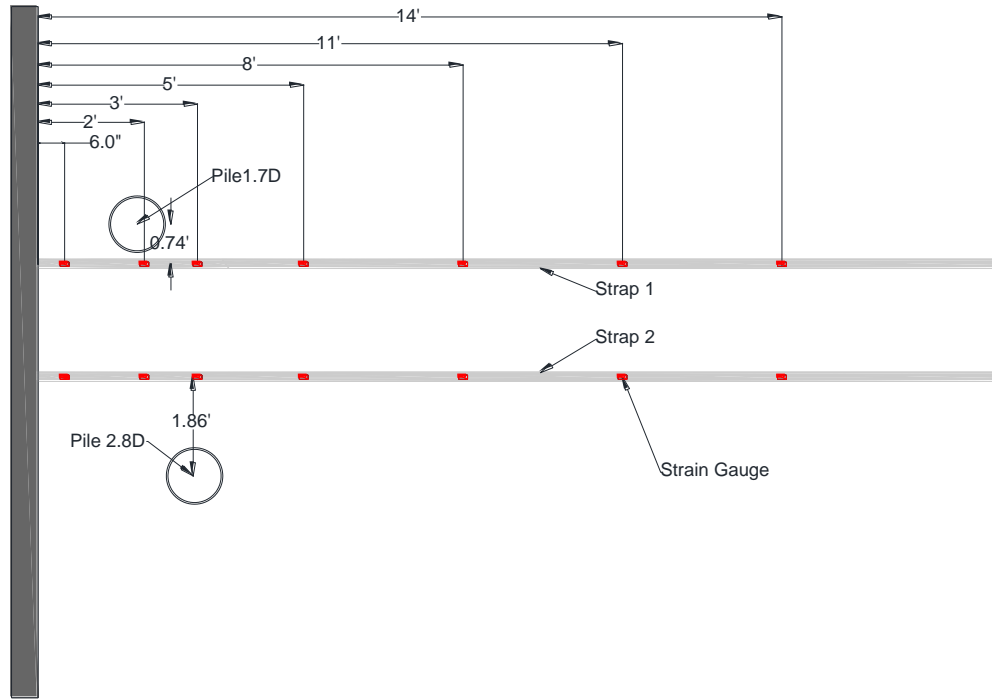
Plan view of the top layer of reinforcement for piles at 1.7D and 2.8D.
